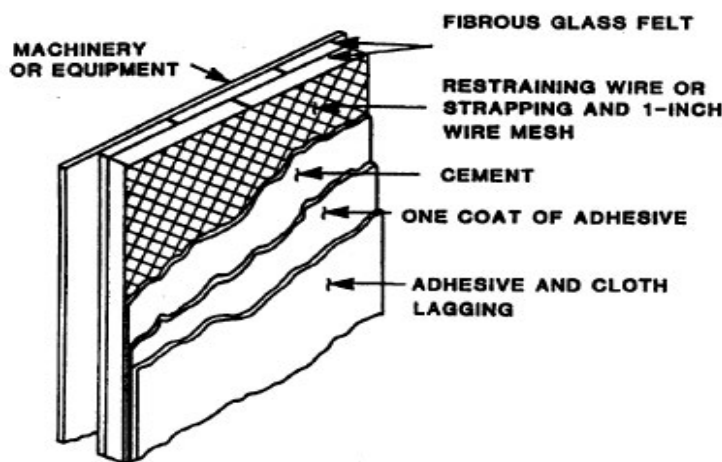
Application of fibrous-glass felt conforming to MIL-I-16411 to machinery and equipment (temperature range 125 to 1200 °F).
